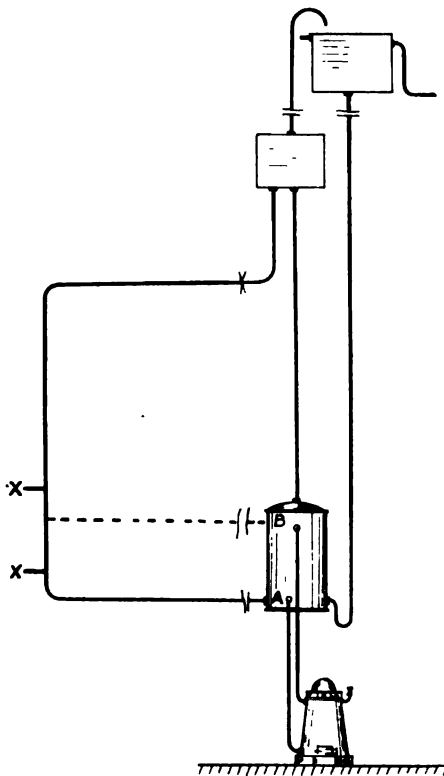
Cylinder and Tank Combined System, showing Defective Connection of Secondary Return.
